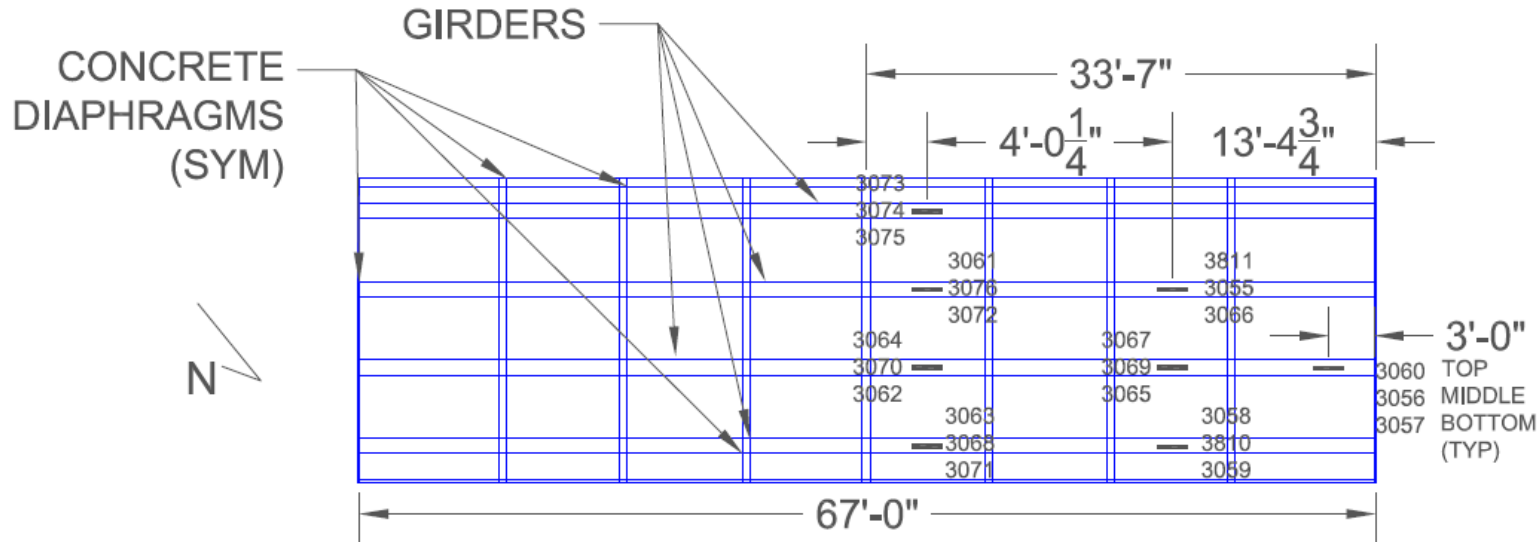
Instrumentation plan view for Bridge No. 5506.
